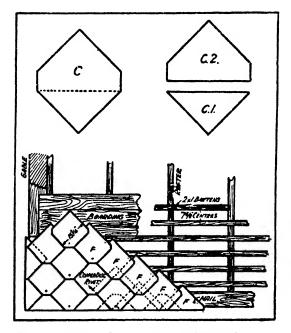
Fig. E.—Asbestos Cement Tile Roofs, showing Tiles fixed diagonally and Method of cutting Tiles to fit the Eaves.
